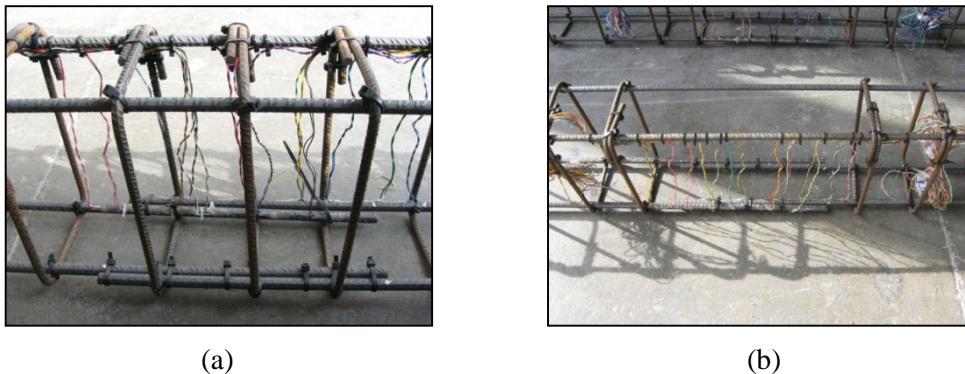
Reinforcement detailing in the splice zone for a) steel confined specimen, b) unconfined specimen
